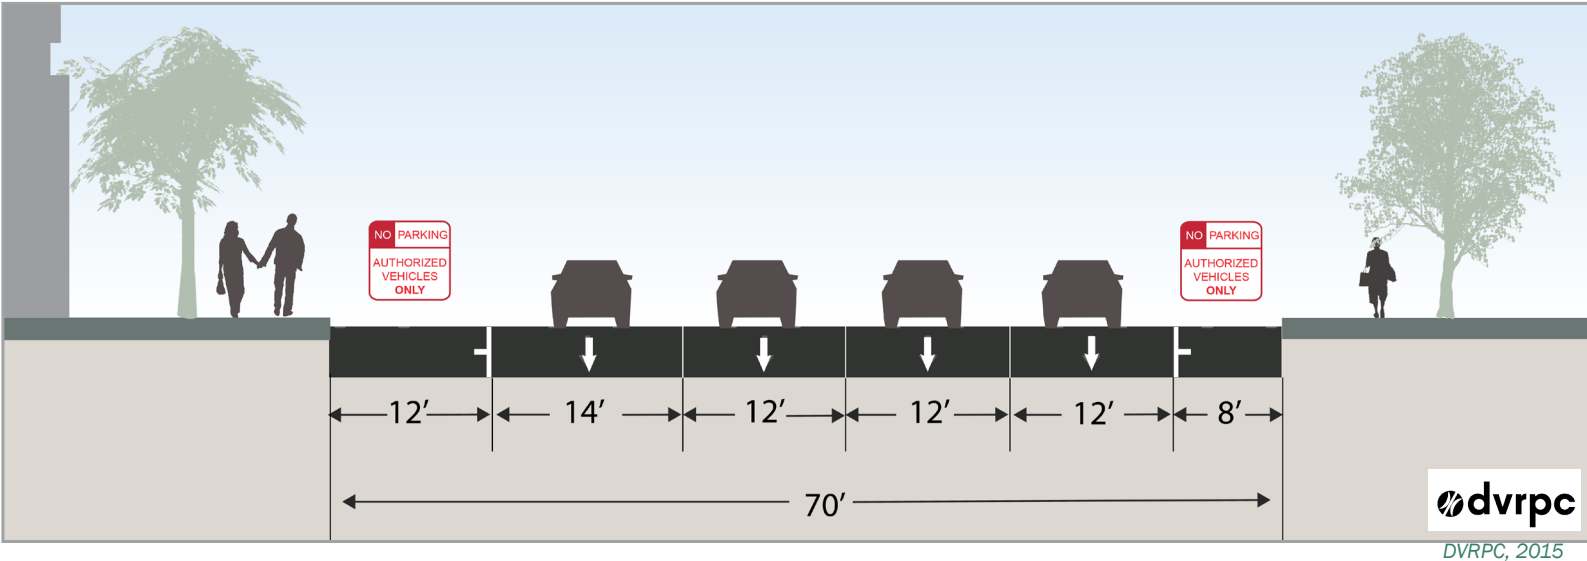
Proposed Design Cross-Section–Race at 7th Street looking west
